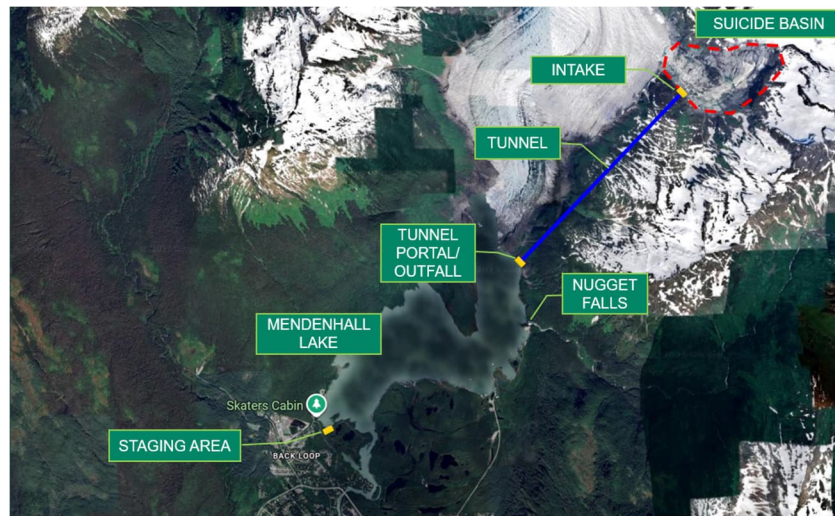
Lake Tap Tunnel Alternative Plan and Profile (Tentative)
